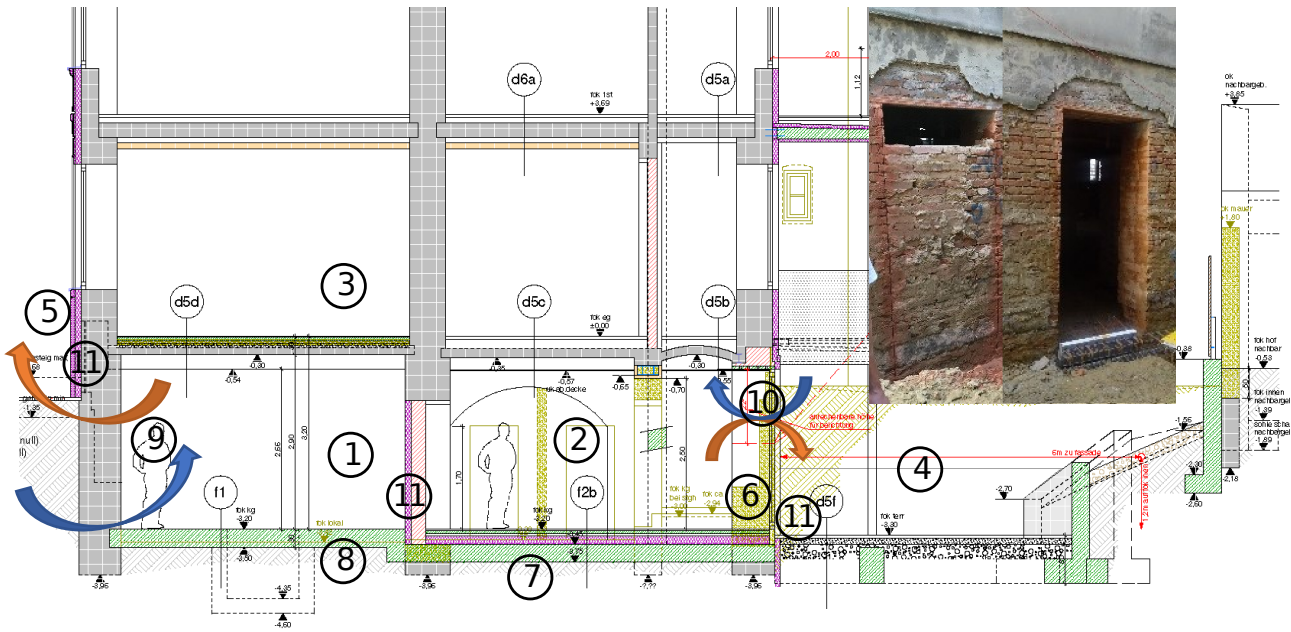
Vertical section of the building with labels indicating where refurbishment actions were taken split into living and storage space. In the upper right a typical construction site where the soil level has been lowered to a sub street level in a buildings backyard and window openings have been accordingly extended to floor level (right part of photograph).
